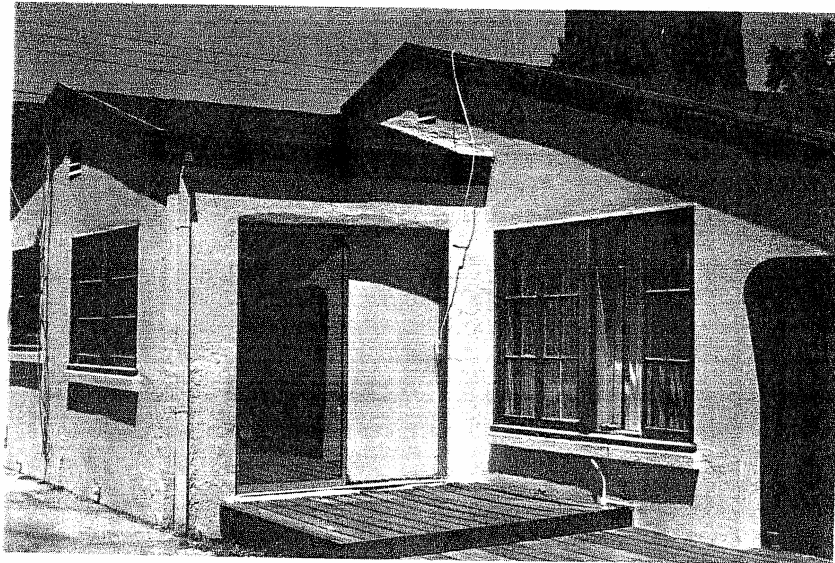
VIEW OF SIDE ENTRANCE AT 471 S. MURPHY. NOTE
